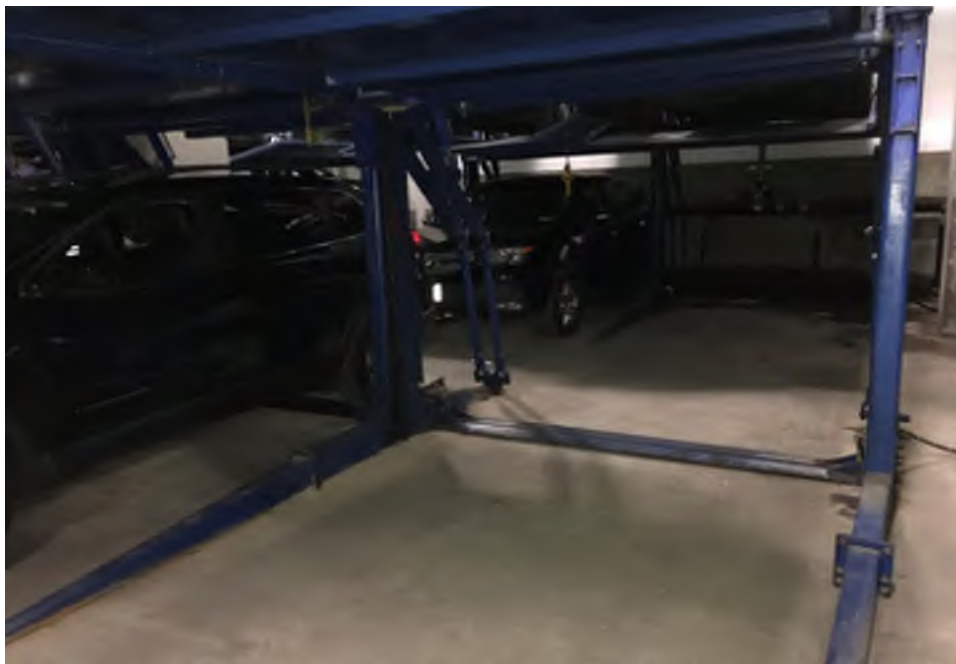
Subgrade parking garage concrete slab, facing northwest. 30 March 2021.
